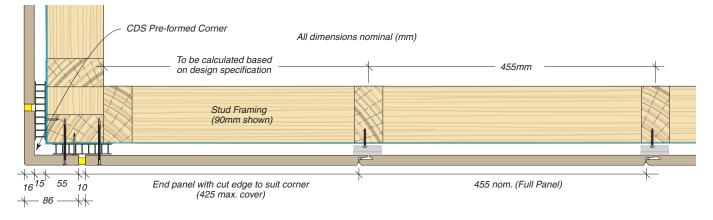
Typical Framing Set-Out with 70mm Timber Framing and CDS Pre-formed Corners - Plan View
